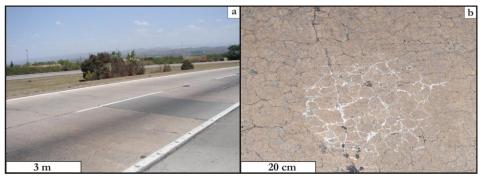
Photographs of the structure. a) Sector of the highway without asphalt cover with partial slab replacement. b) Map cracking with white material filling fissures.
